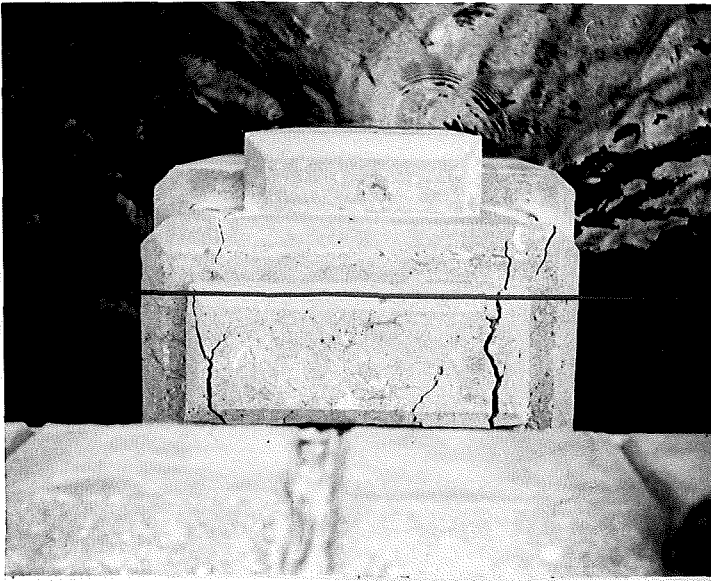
SOUTH END OF FIRST PIER ON EAST END OF BRIDGE SHOWING CRACKED PIER AND CRACKS UP THROUGH DECK AND PILASTER.
